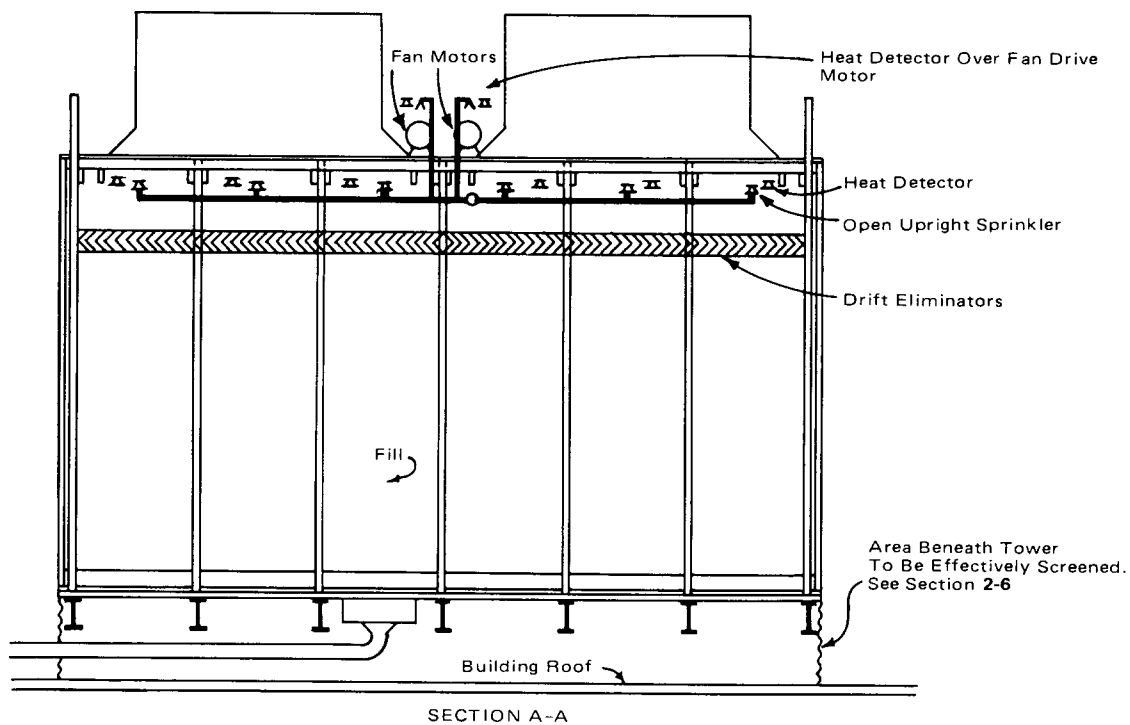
(b) Typical deluge fire protection arrangement for counterflow towers.
